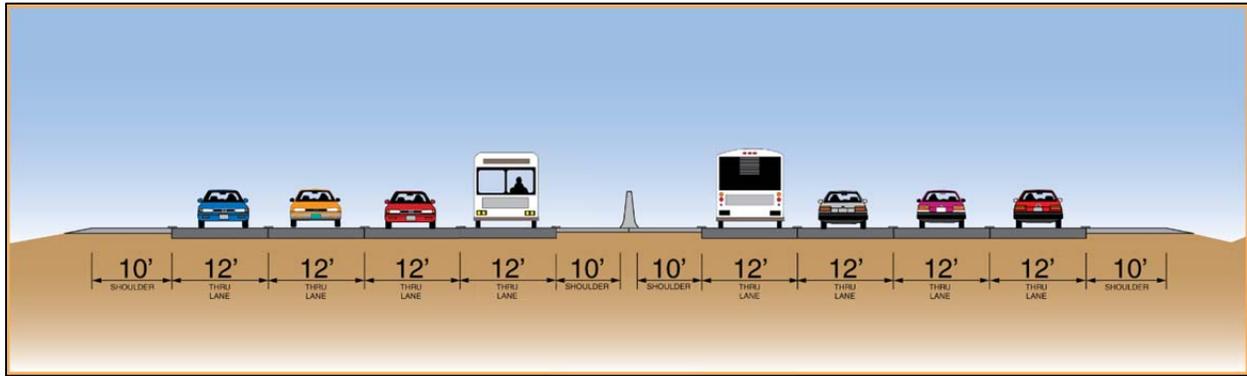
I-35W (Existing Rural Six-Lane Section Roadway)
